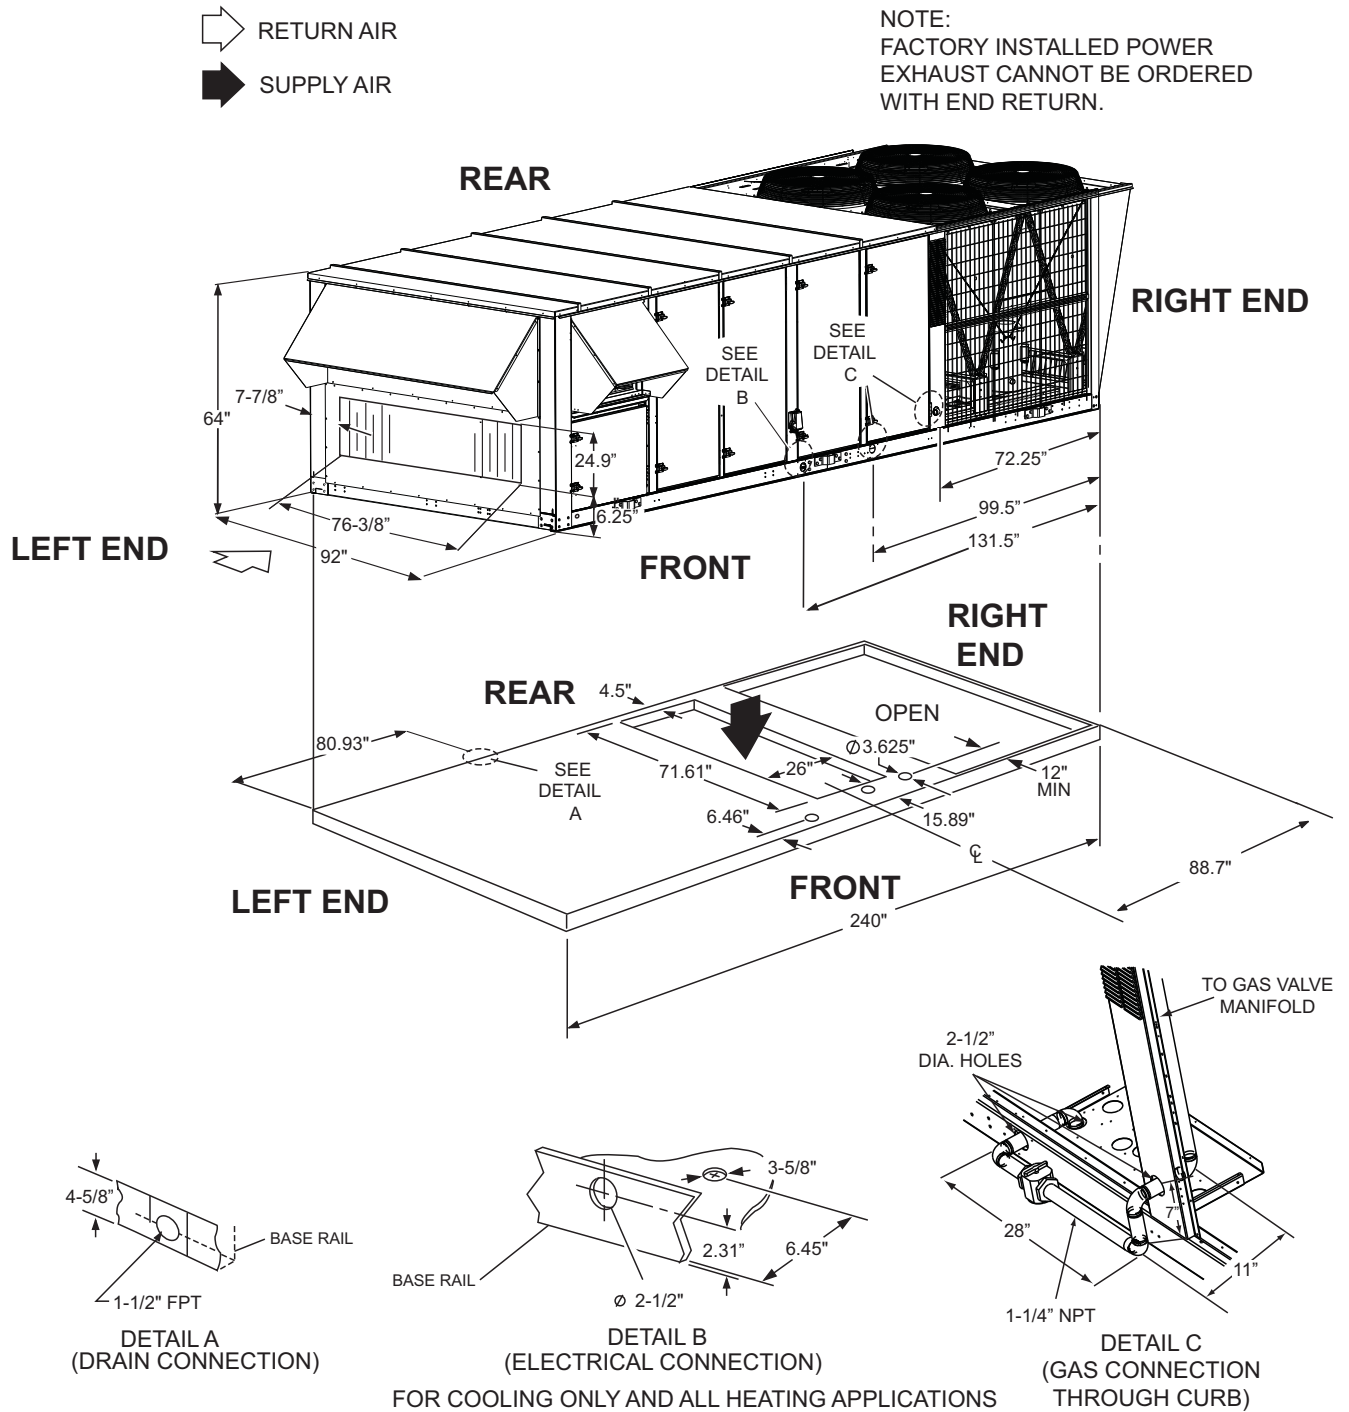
END RETURN, BOTTOM SUPPLY
